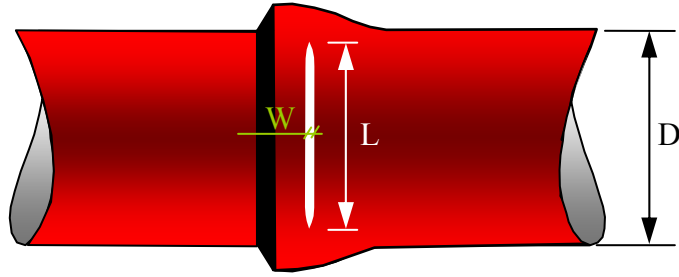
Schematic Drawing of Local Tear of Pipe Wall
